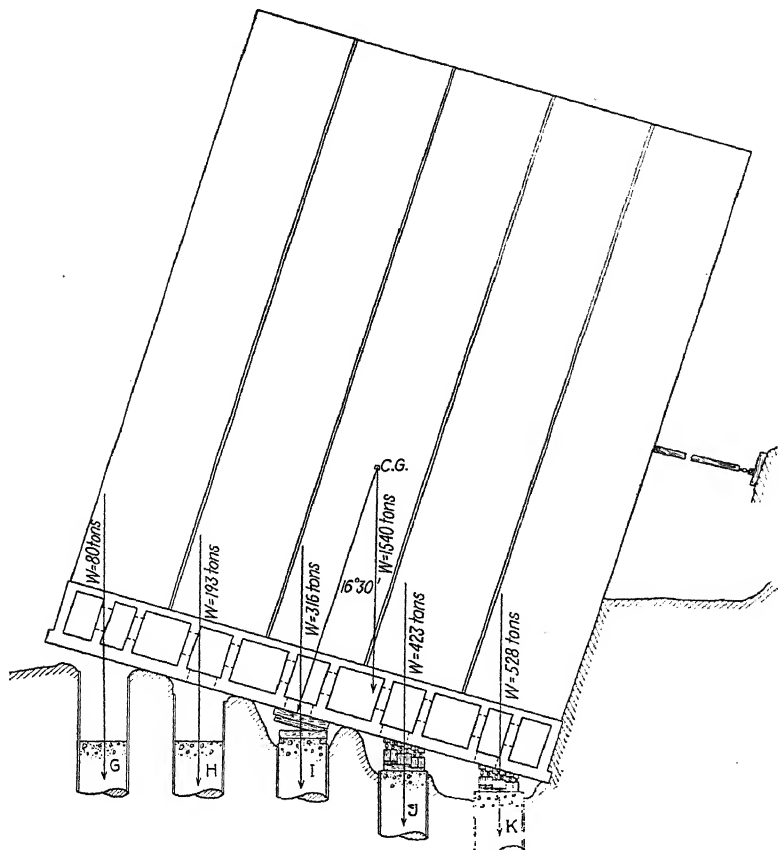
Section through the binhouse of the Winnipeg elevator. (Courtesy of Foundation Company.)
